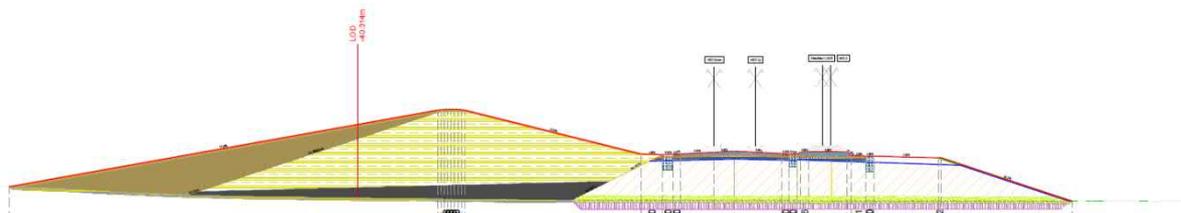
Cross Section of Twyford Embankment at Ch.HS2 81+620
